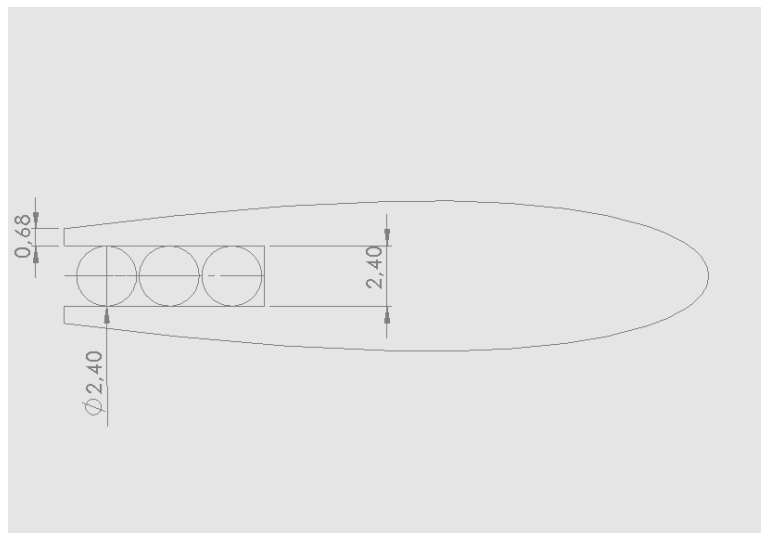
Drawing of the inclined bar with the cables in the hole; scale 1:180.
